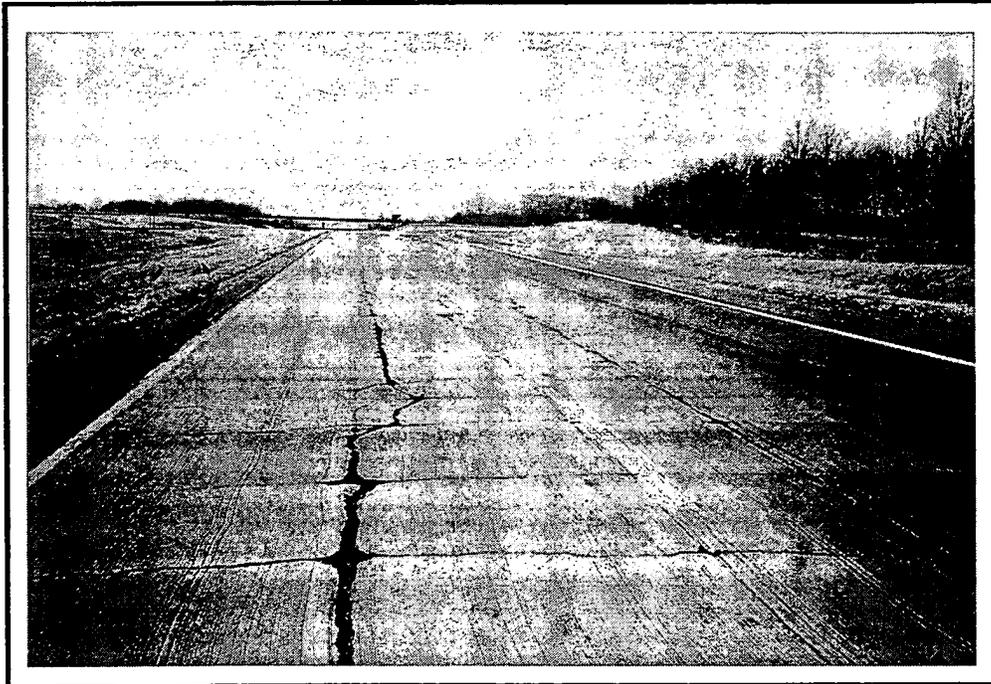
Longitudinal Cracking in CRC Pavement, High Severity
